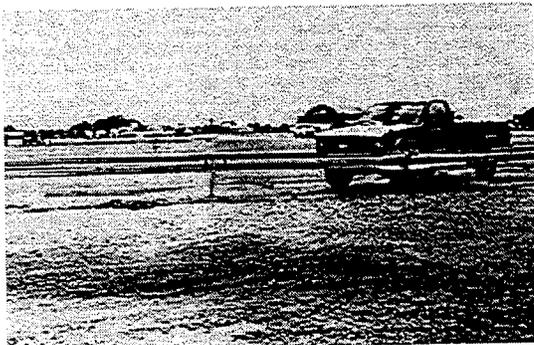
Sequential photographs for test 473750-3 (overhead & frontal views) (continued).
